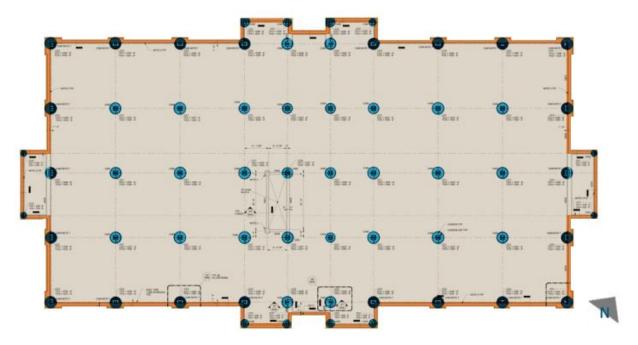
(above) Modified AES foundation plan with caissons highlighted in blue and grade beams highlighted in orange.
